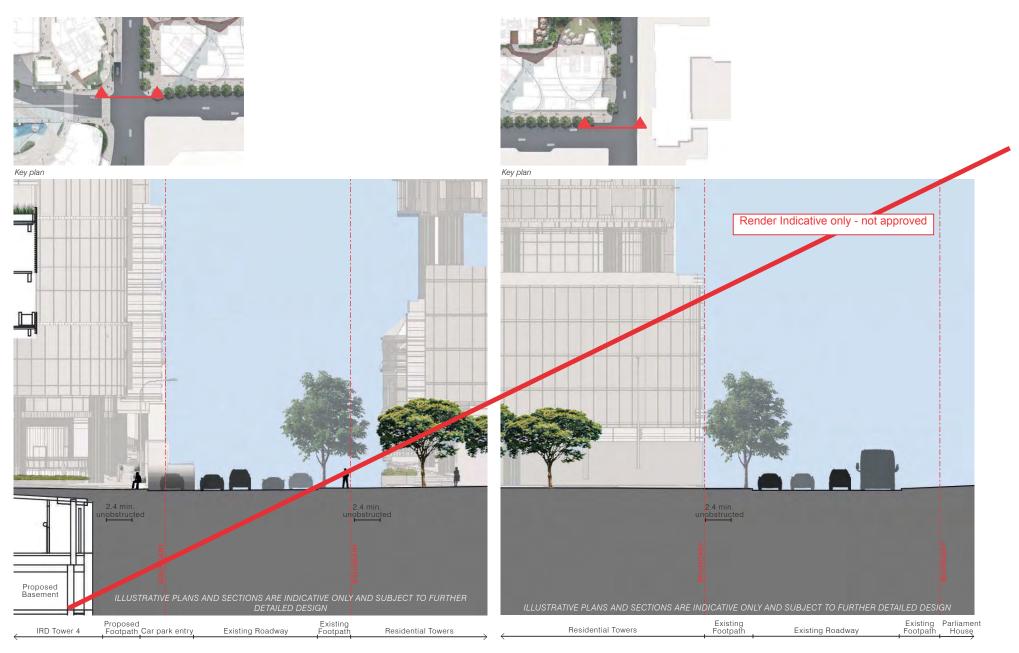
Margaret Street sectional elevation at William Street intersection looking North
